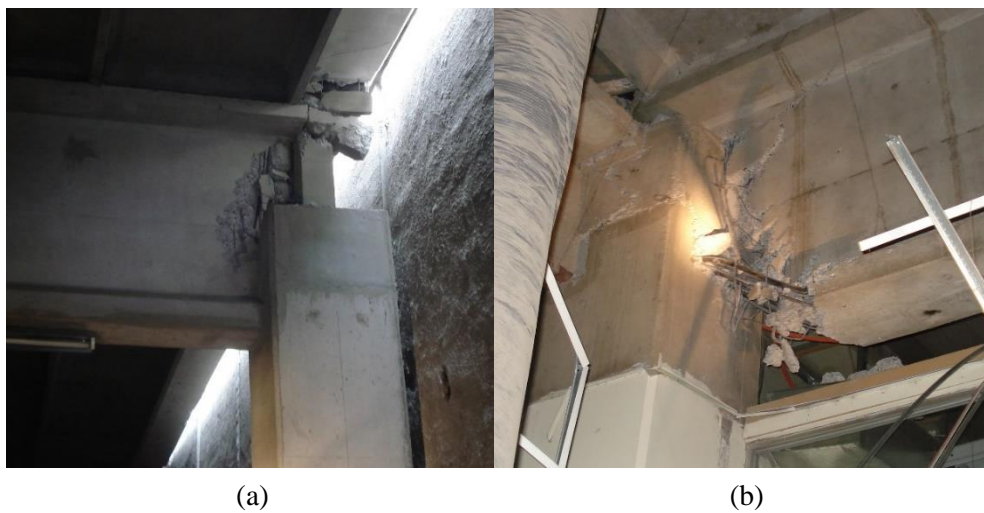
(a)-(b) Heavily damaged beam-column connection.
